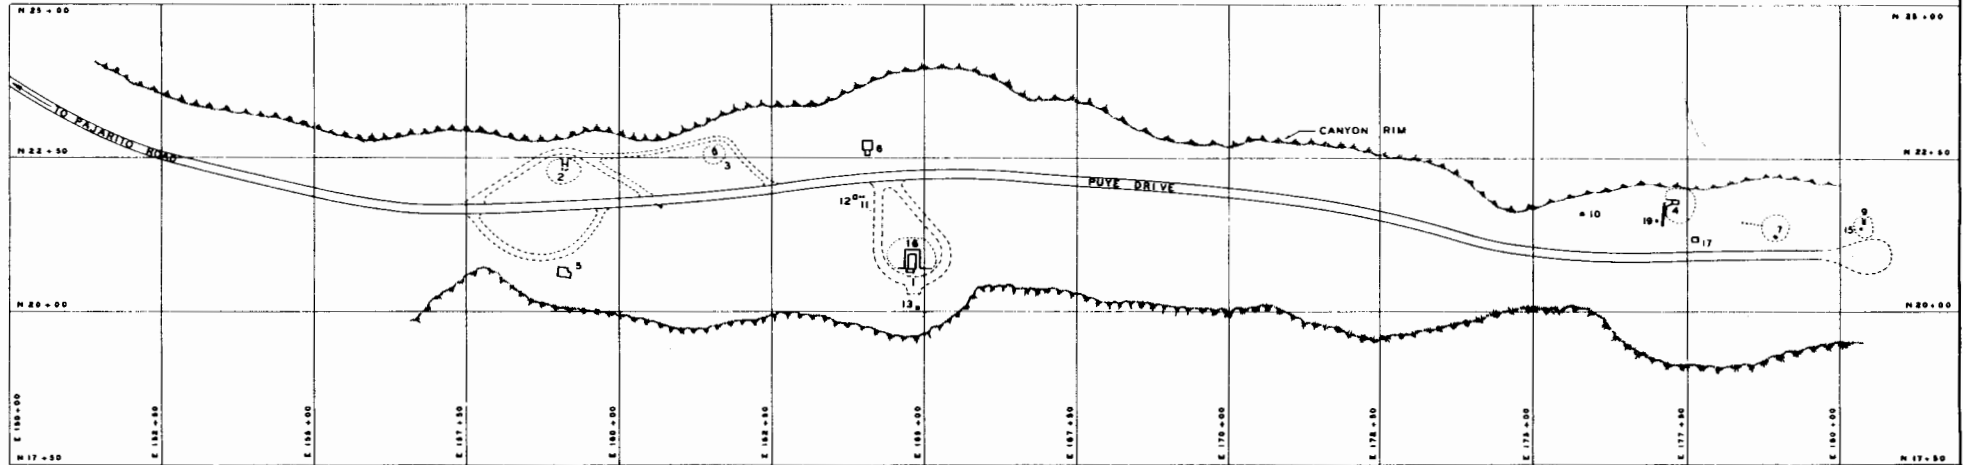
Structure Location Plan for TA-5 - Beta-Site
